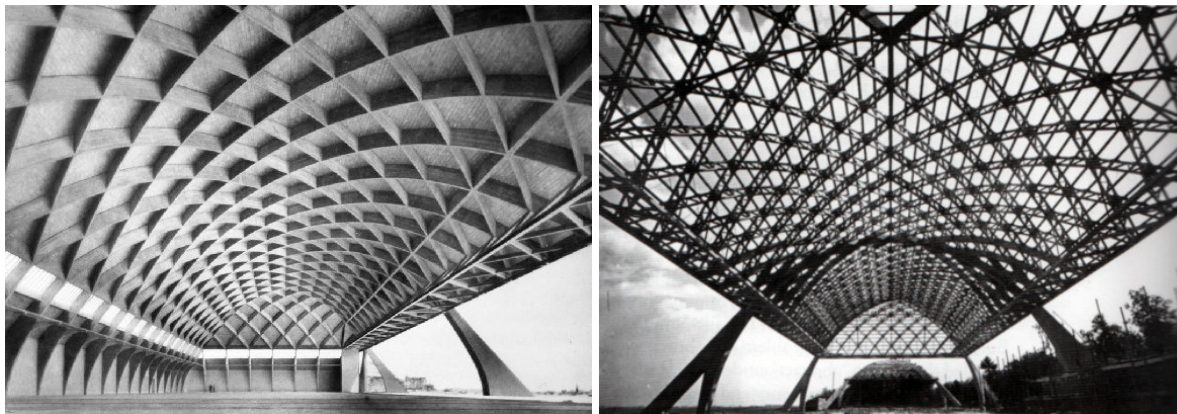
(left) Orvieto Airport Hangar Fig 3.22b (right) Geodetic Frame of Hangar made from pre-cast reinforced concrete trusses. (<http://en.structurae.de/structures/data/index.cfm?id=s0000050>)
